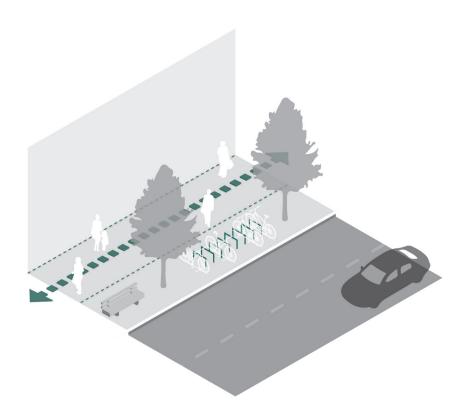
Cycle parking positions coordinated with routes, street furniture and planting to avoid clutter
